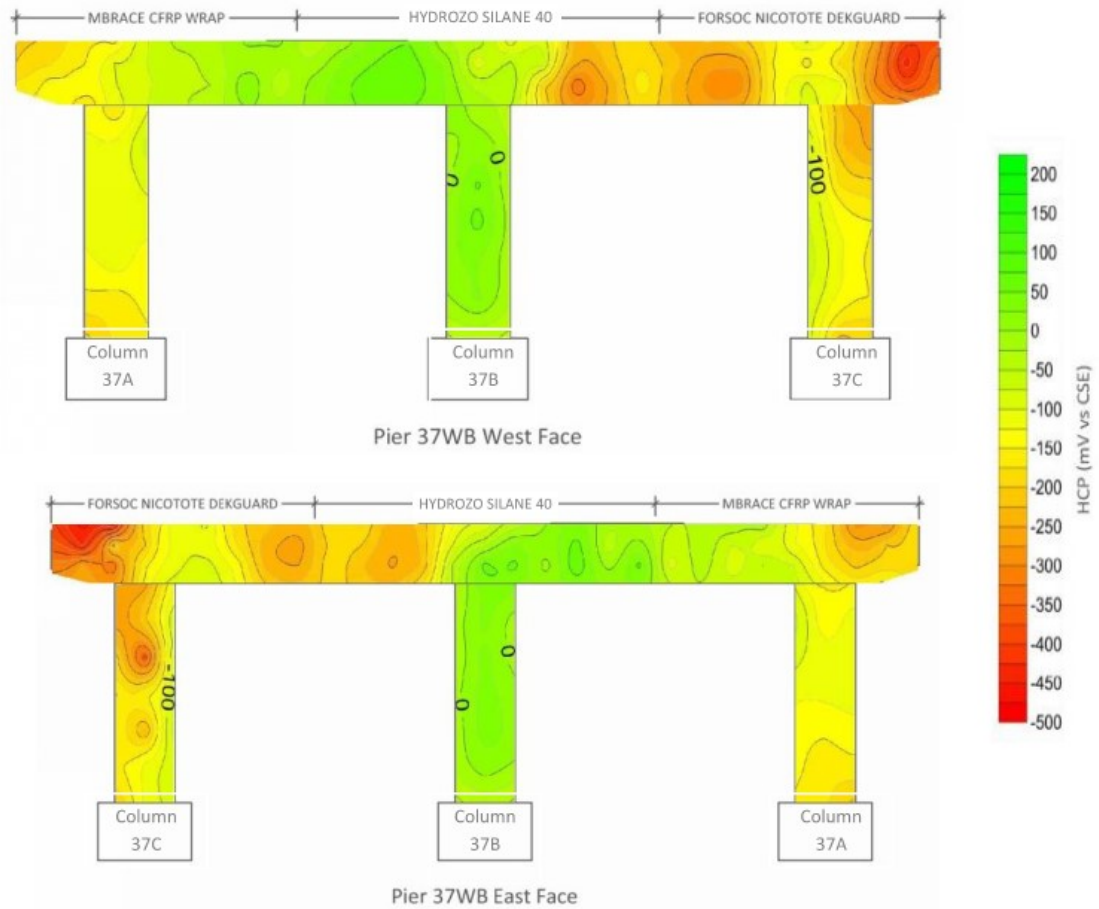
Pier 37WB [ECE] - Results of half-cell potential testing at west and east faces
